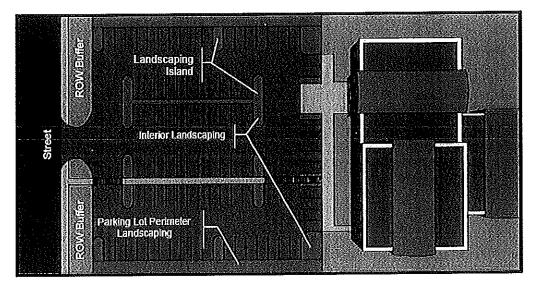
Island, Interior, and Perimeter Landscaping Plan View Illustration
